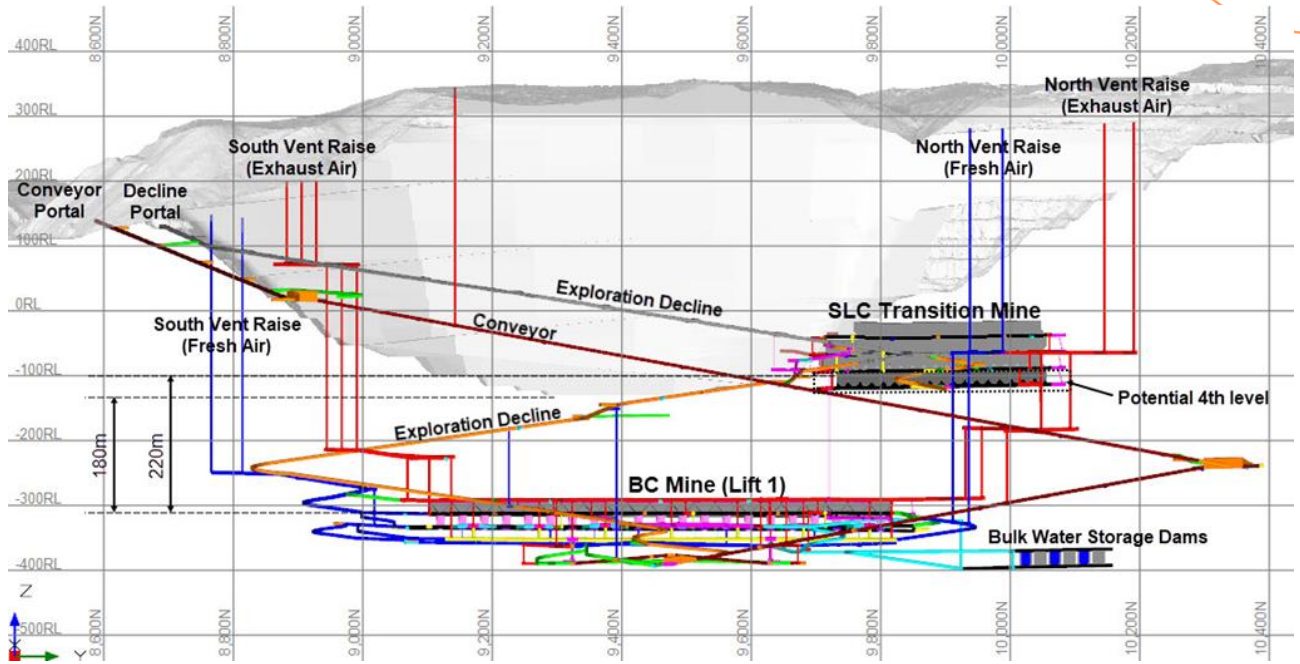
North Pit, BC and Transition Mine, vertical section looking west (FS)
